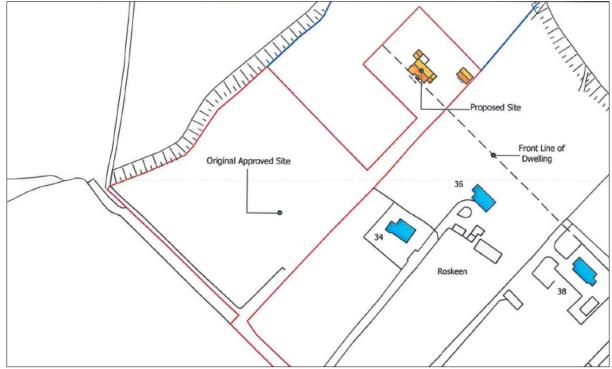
Current site location plan showing approx. location of previously approved dwelling and garage; and location of the change of house type including garage proposed.
